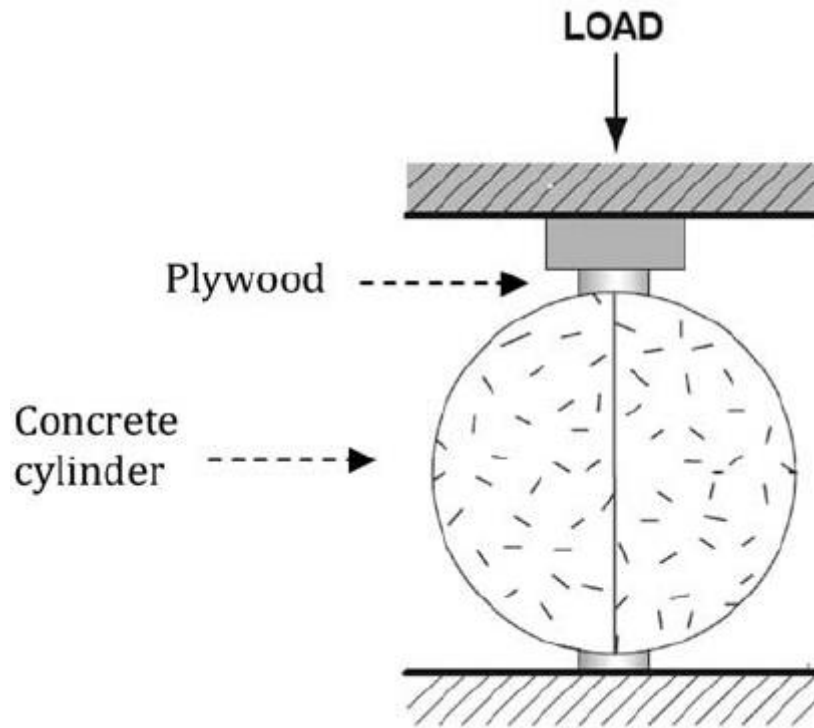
Schematic Drawing of Split Tensile Test (Courtesy of Roohollah Bagherzadeh)
